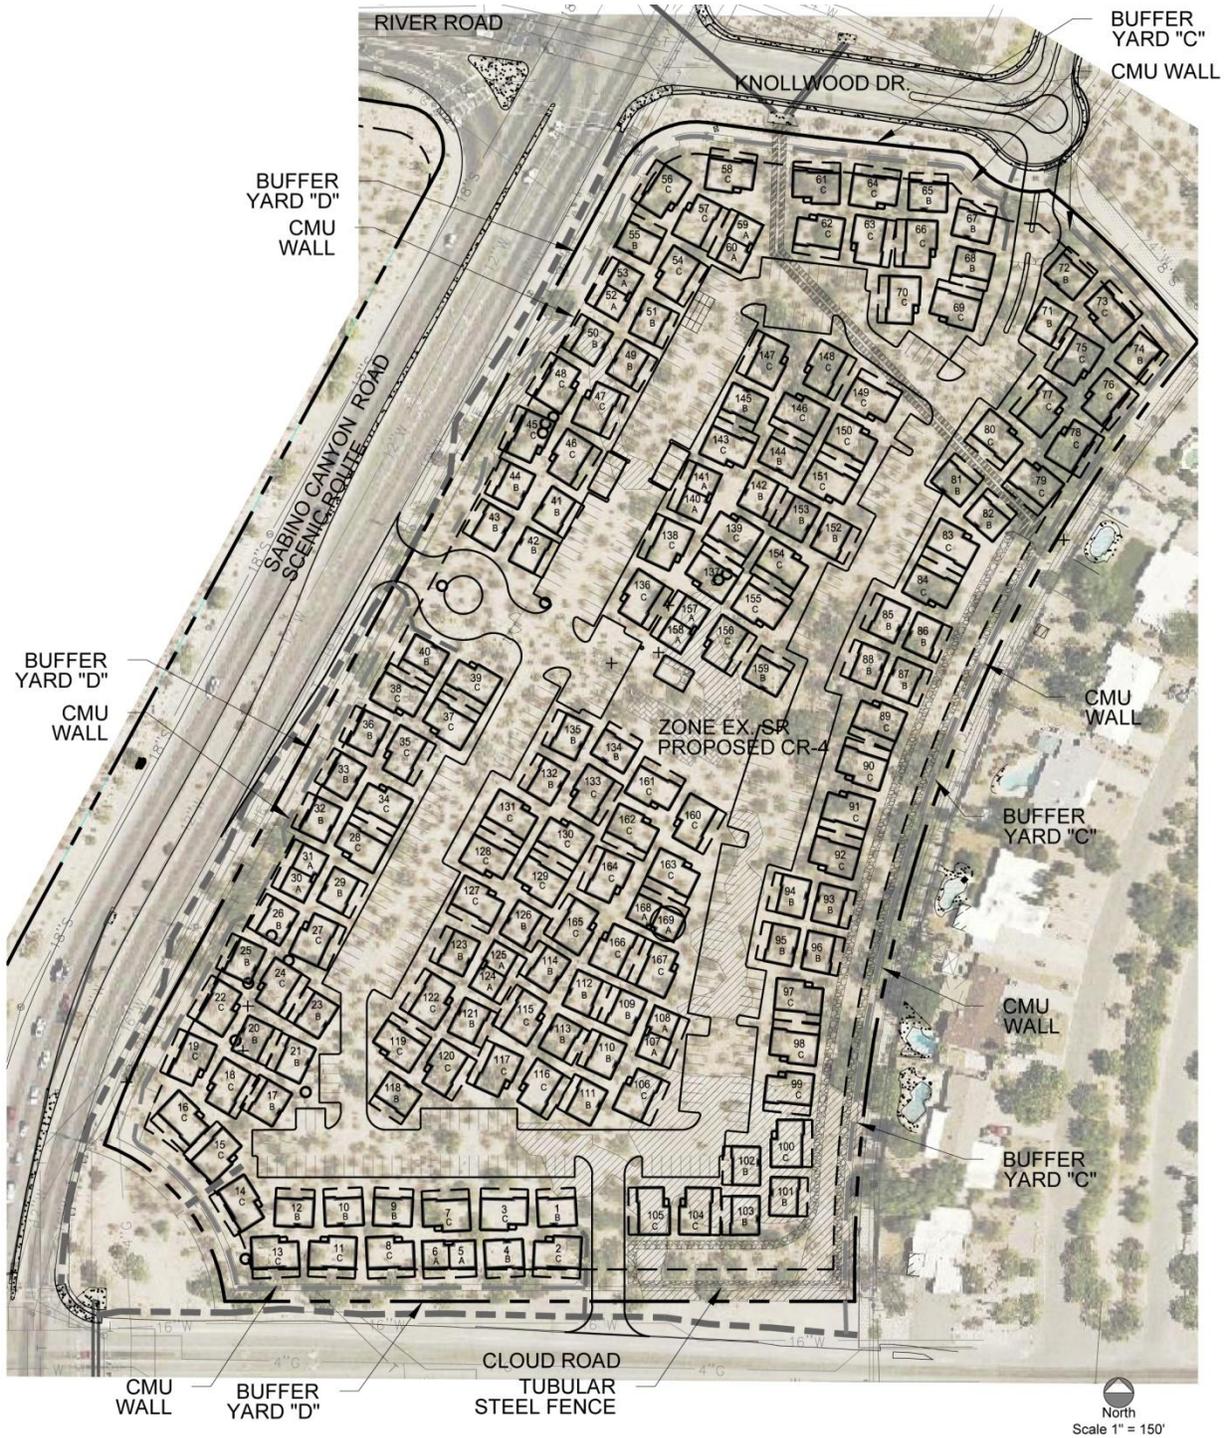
Exhibit II.F illustrates the buffers that will be utilized. Site is zoned SR and proposed zoning is CR-4. The Adjacent property East is zoned CR-2. There is an existing alley that separates the properties. The differing zones will require a Buffer yard “C” as the existing alley is not wide enough to satisfy the buffer yard requirements but will aid in mitigating the impacts from the proposed development. Roads North, South and West of property will require buffer yards. Sabino Canyon Road is Scenic Major Routes and requires a Buffer yard ‘D’. Widths will vary from 10’ to 20’ allowing flexibility of design and incorporating existing vegetation and site amenities to serve this development and surrounding community. Knollwood Drive and Cloud Road are side yards and require buffer yard “C” designation. Widths will vary from 5 to 20 feet allowing flexibility of design, incorporating existing vegetation, and site amenities to serve this development and surrounding community. Perimeter development that integrates screening requirements and planting along with pedestrian walks or trails and passive water harvesting improve the projects integration with the existing community. All buffer yards will be in compliance with Chapter 18.73 of Pima County Zoning Code.
